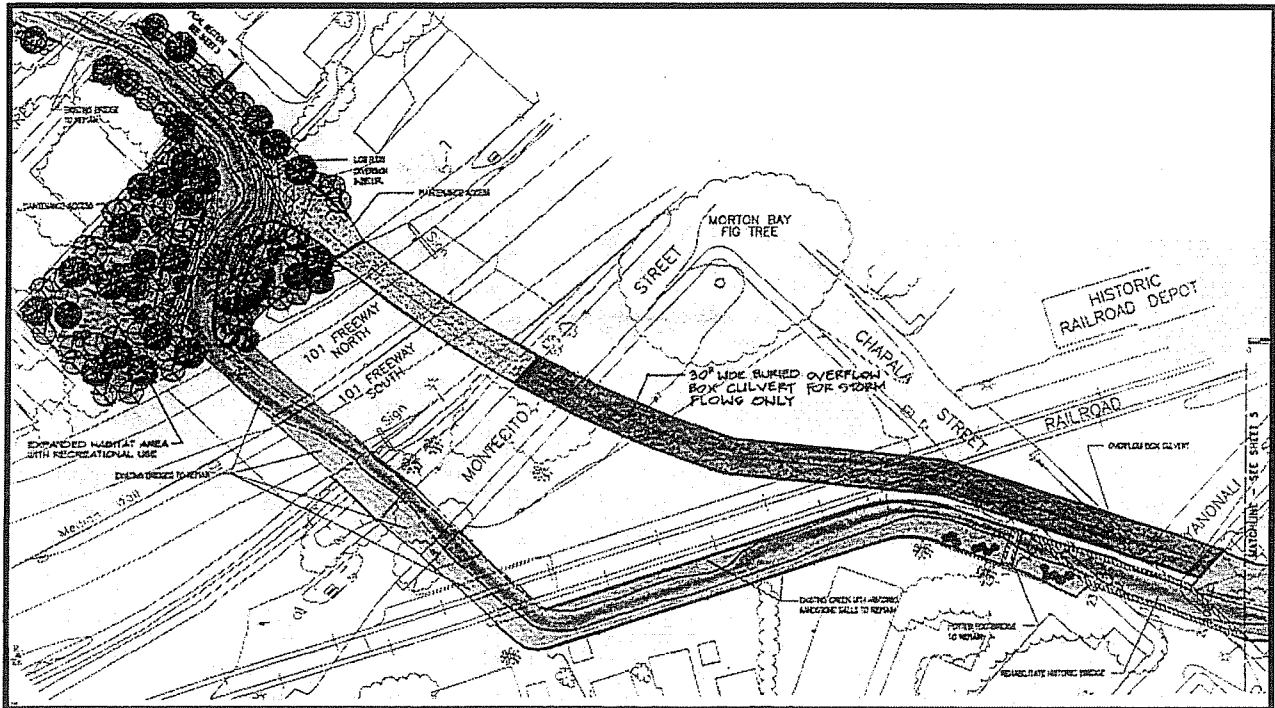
New Overflow Culvert that Bypasses the Oxbow between Highway 101 and Chapala Street Bridge
